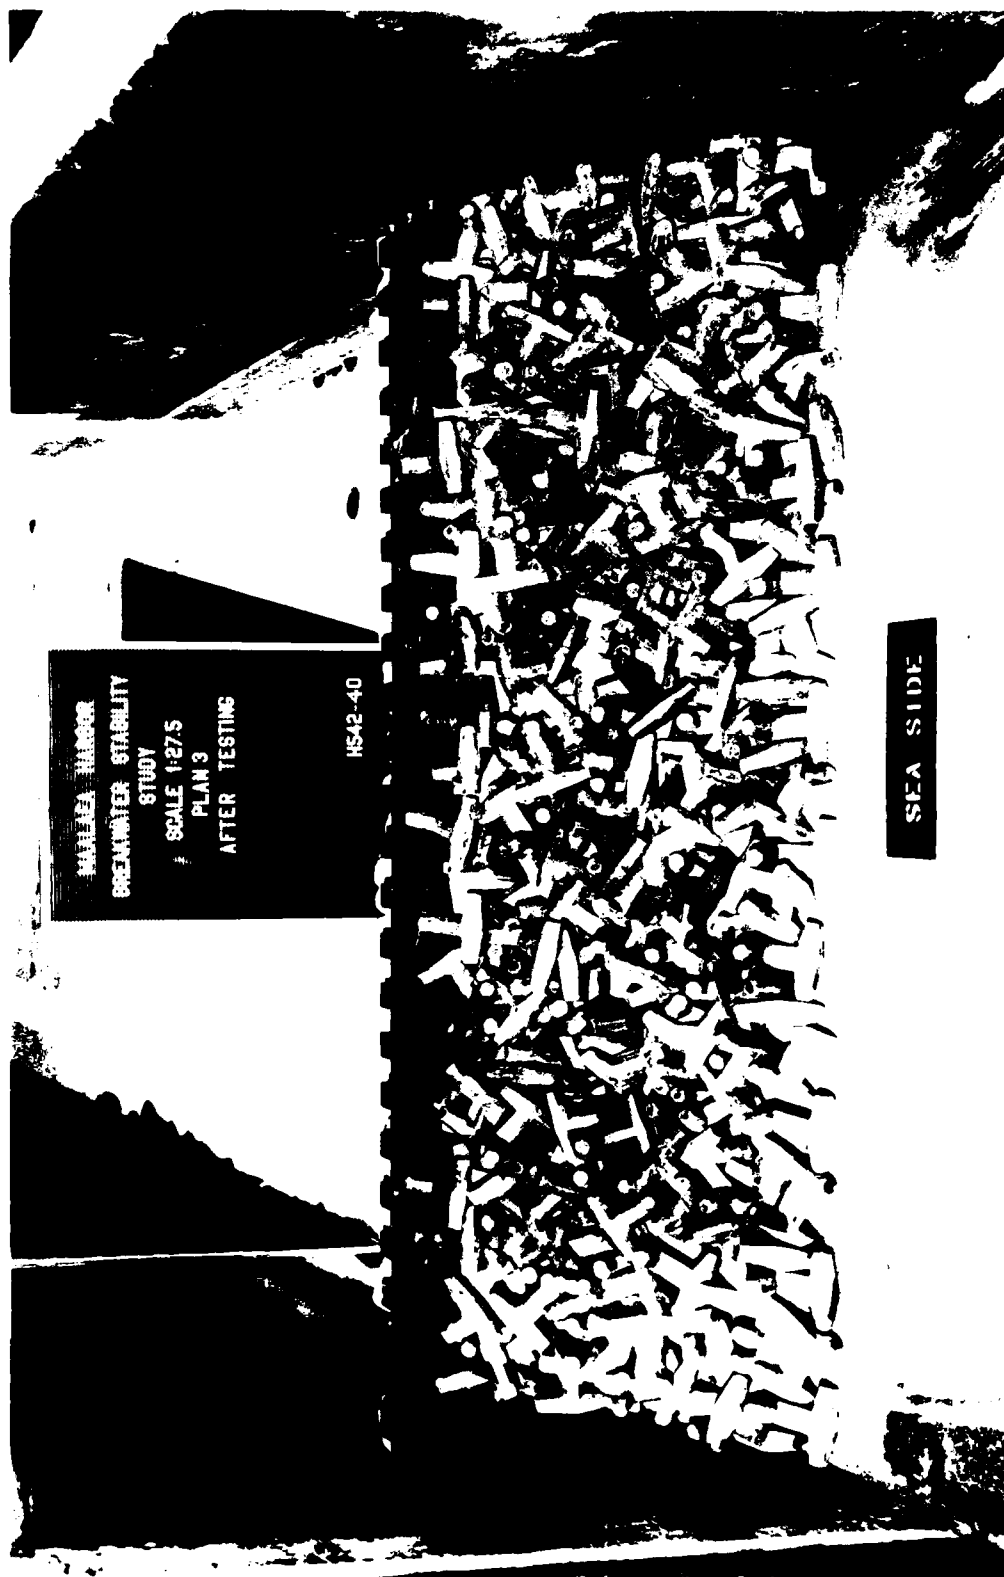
Sea-side view of Plan 3 after attack of 16-sec, 16.7-ft breaking waves at an angle of 45° to pile
